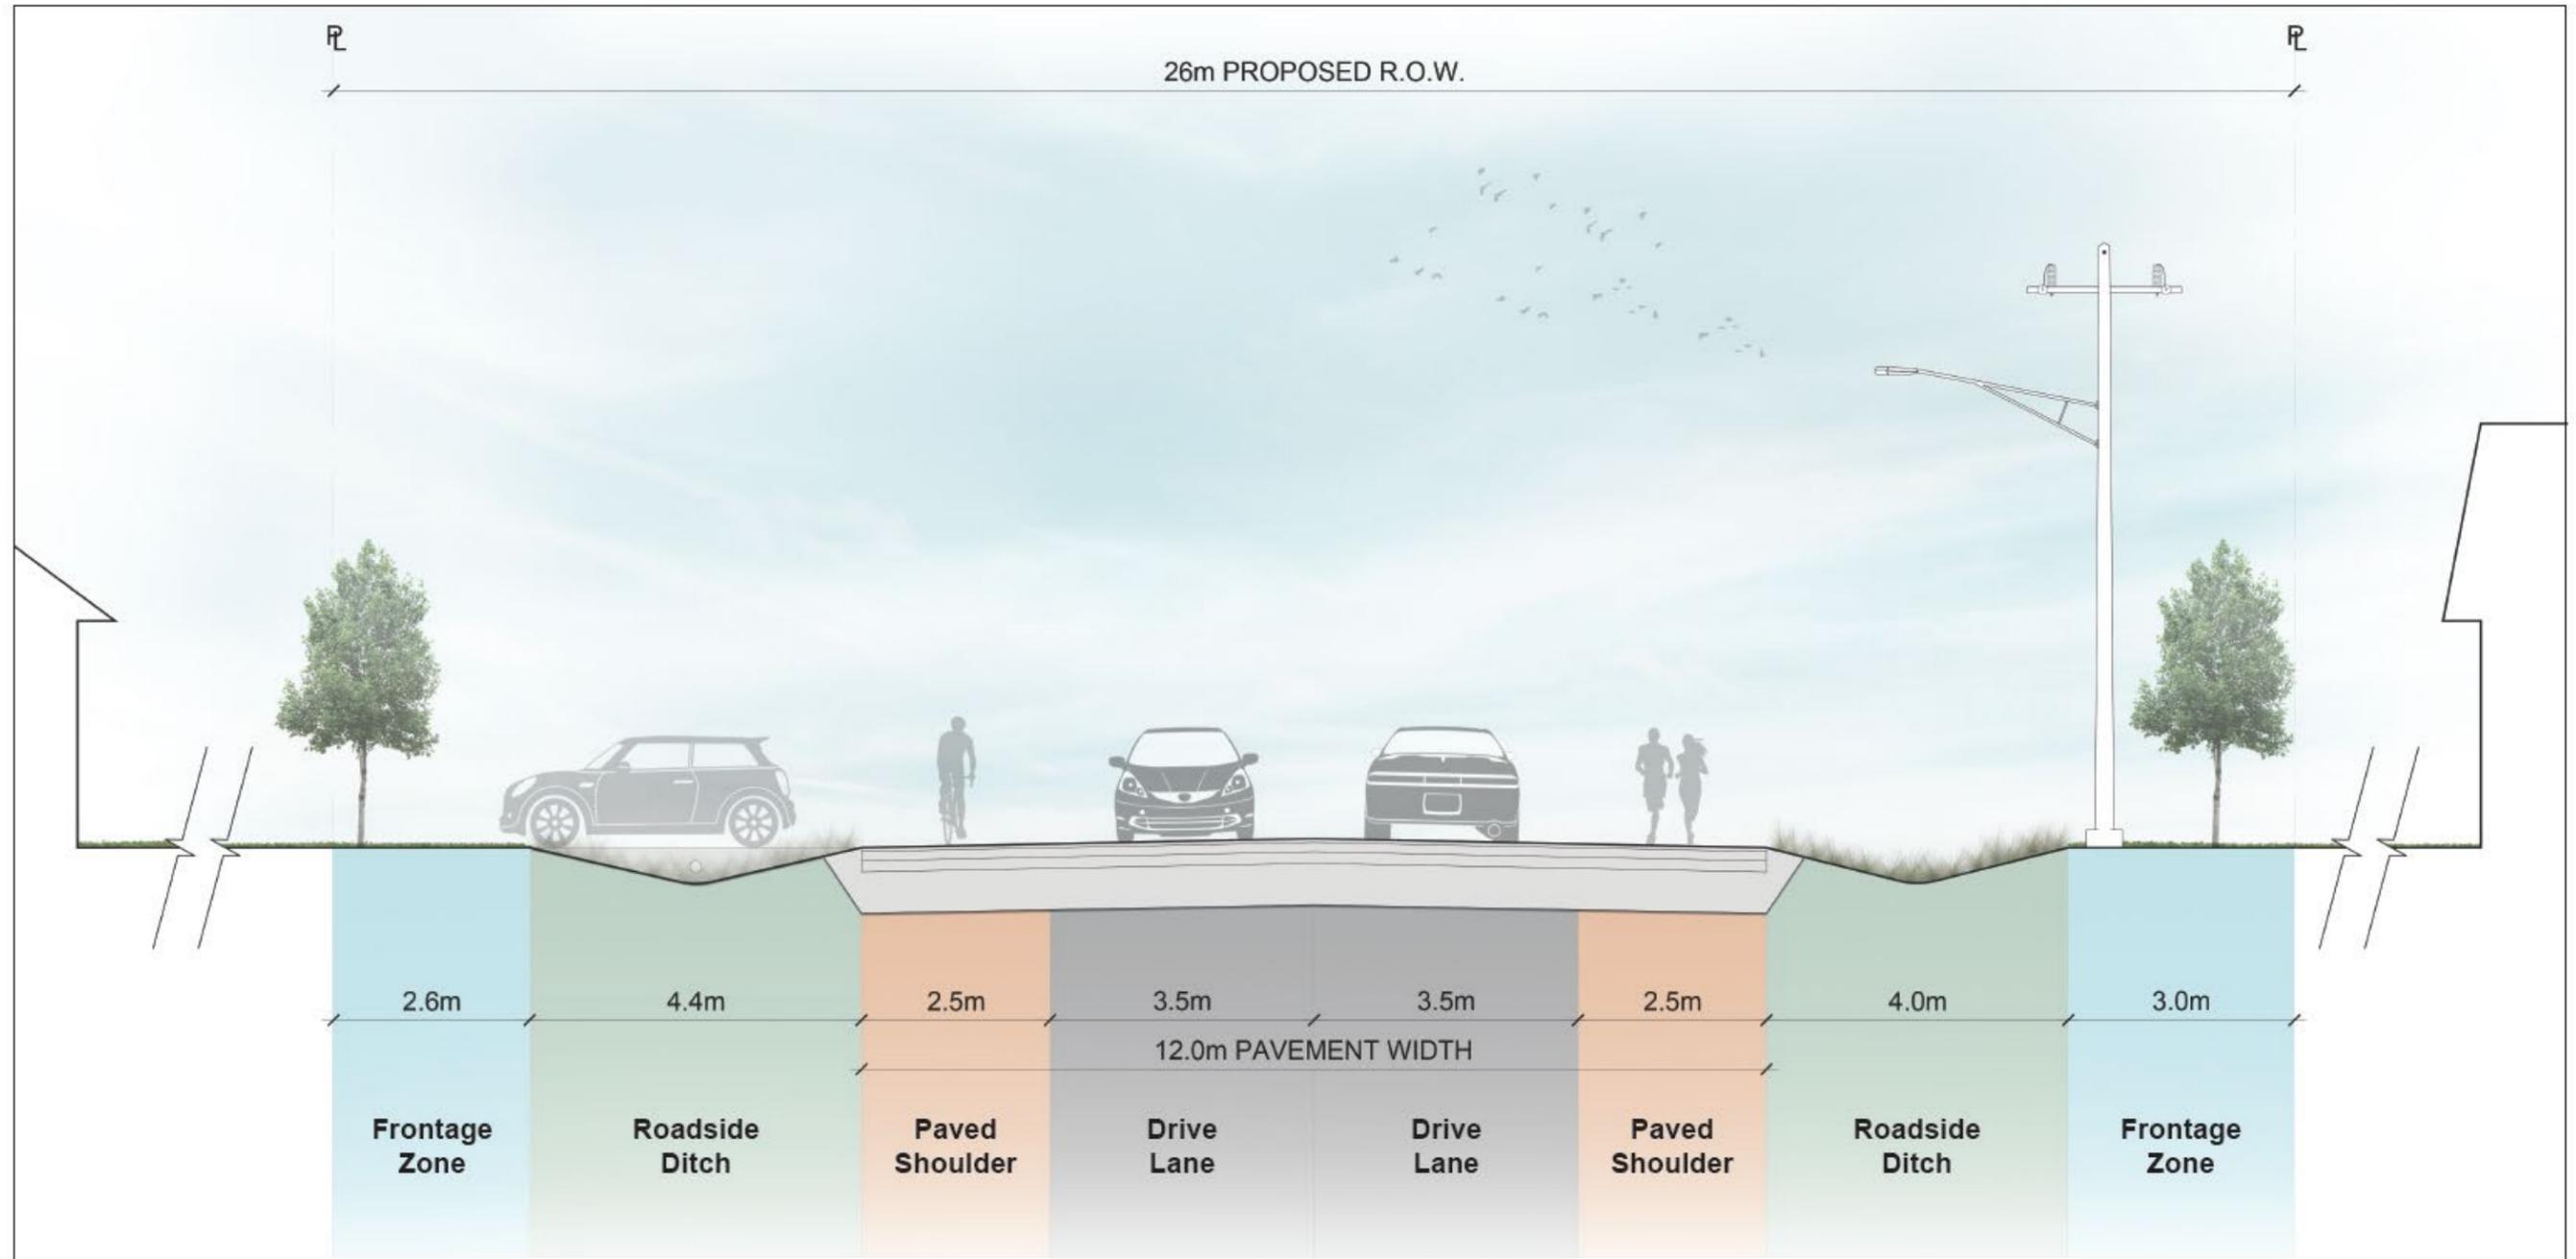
Neighbourhood Residential Street (Rural) – Conceptual Application B (New Road)
